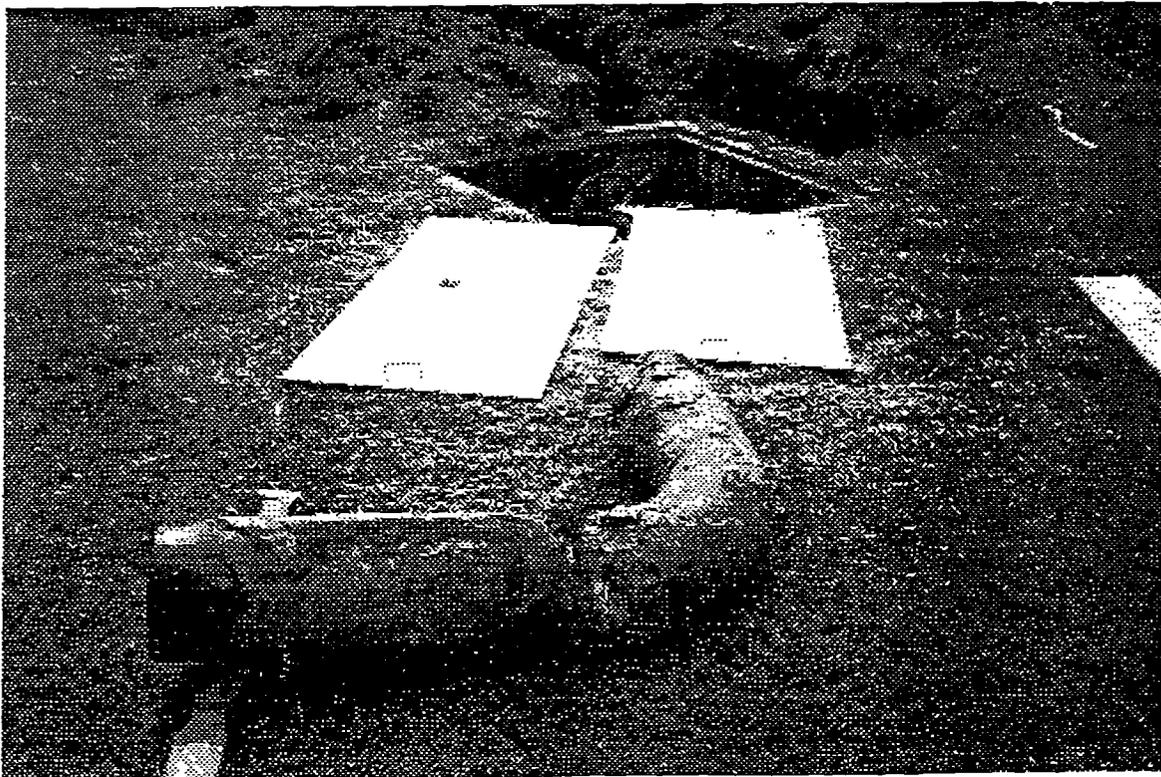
10" coated steel pipe removed from valve pit and trench. Piping was in good shape.
